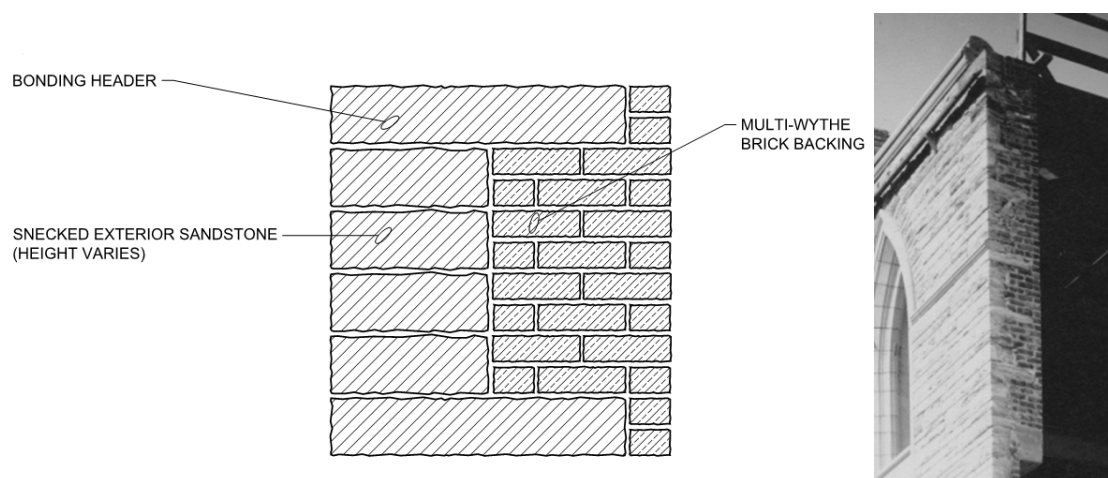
Typical Centre Block Exterior Masonry Wall Section
